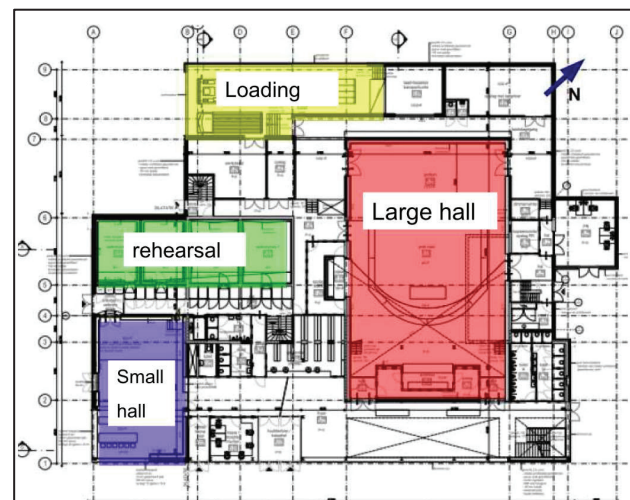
Ground floor plan of Hedon Zwolle (NL)
